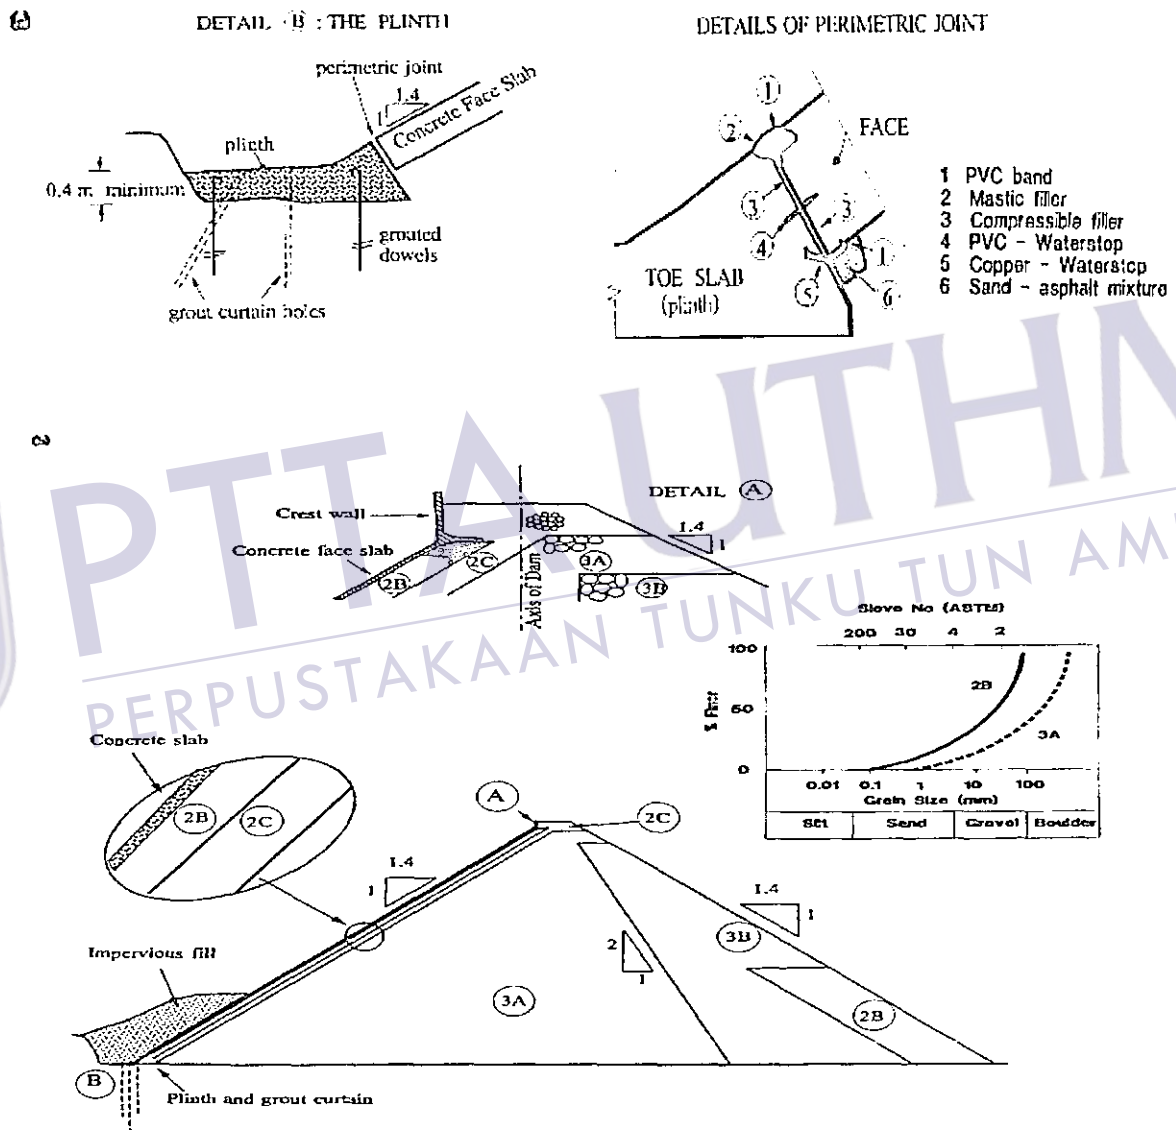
(a): Cross-section and detail of the 'plinth' and perimetric joint.
